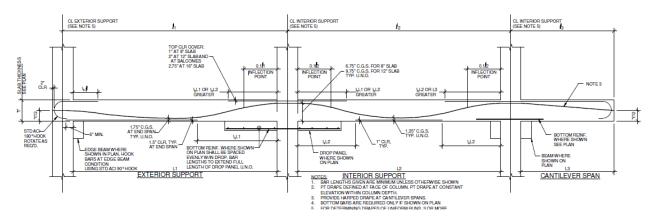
| Two Way PT Slab Reinforcing Diagram (Courtesy of WPM)
